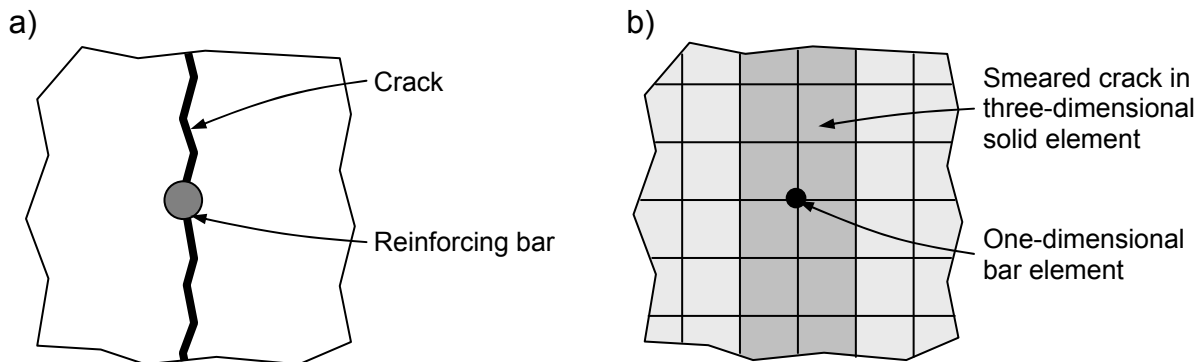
Reinforcing bar in crack: a) Experimental test; b) Numerical test
